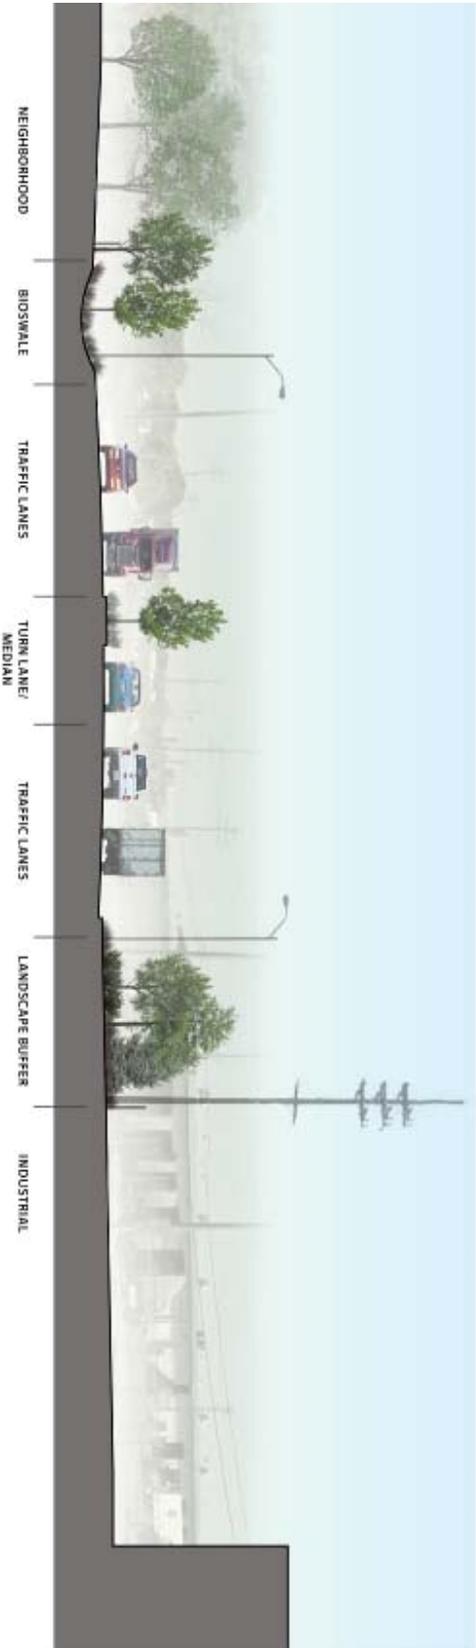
Hall Street (Blase Avenue to Riverview Drive) Section
